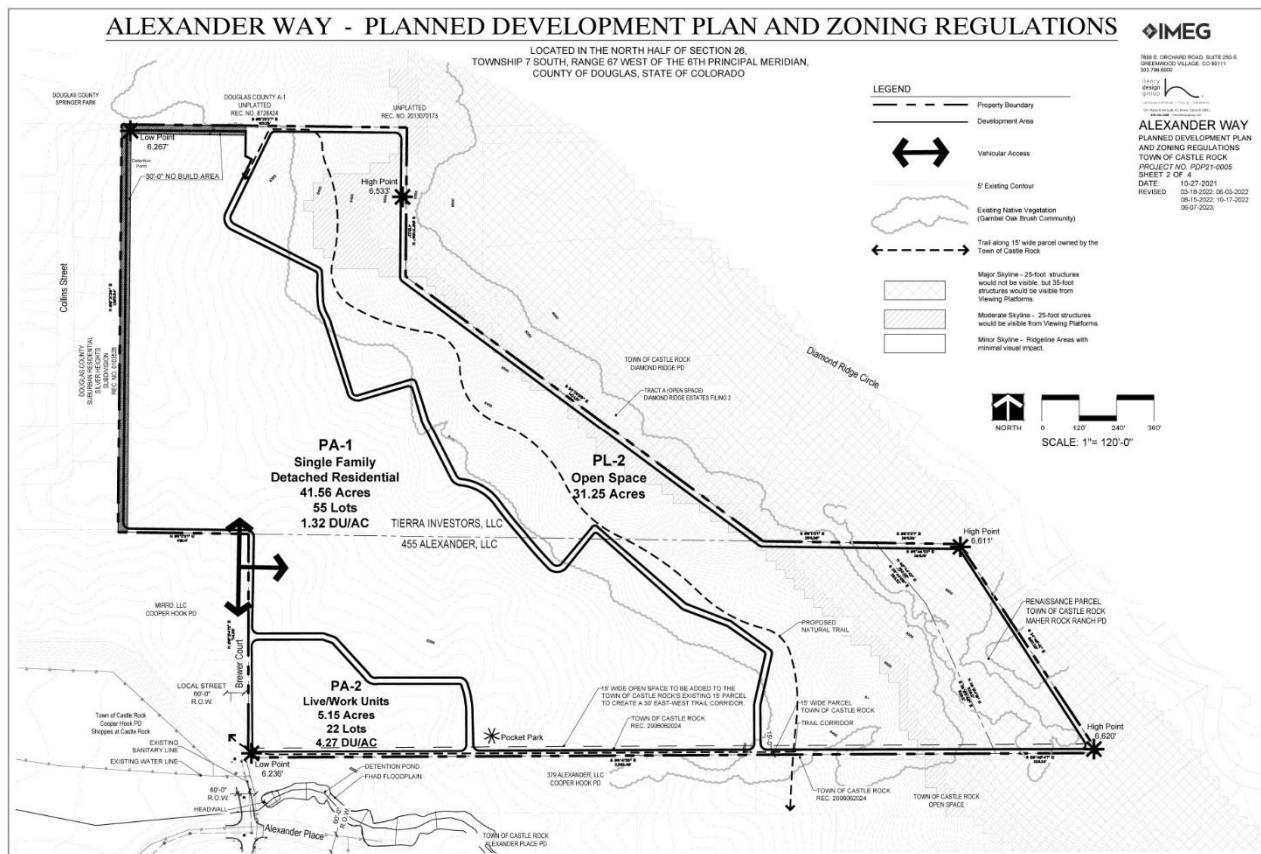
Alexander Way – Planned Development Plan and Zoning Regulations
